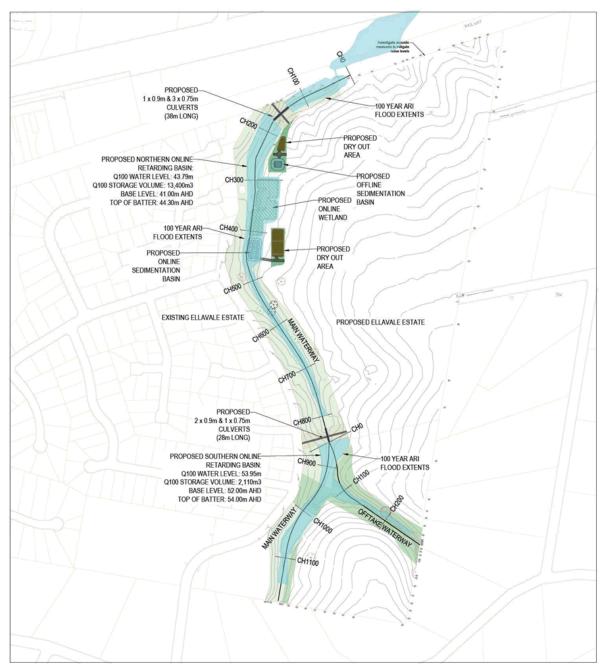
SWMS Concept Layout Plan Source: Ellavale Estate Eastern Extension Stormwater Management Strategy. Not to scale
